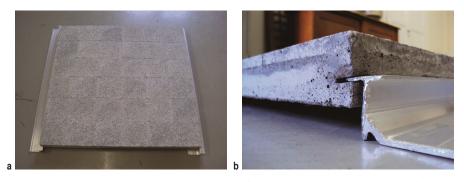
A façade panel on anchors, manufacturer Tabaš: a) a pilot element with installed anchors, b) a detail
